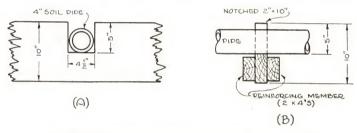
(A) Joist Cut for Piping (B) Reinforcement of Cut Joist
